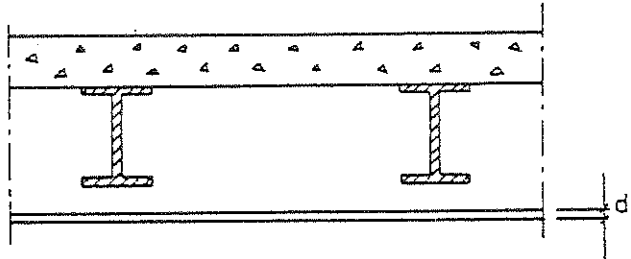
Floor structure, composed of a reinforced concrete slab, load-bearing steel beams, and an insulating ceiling
